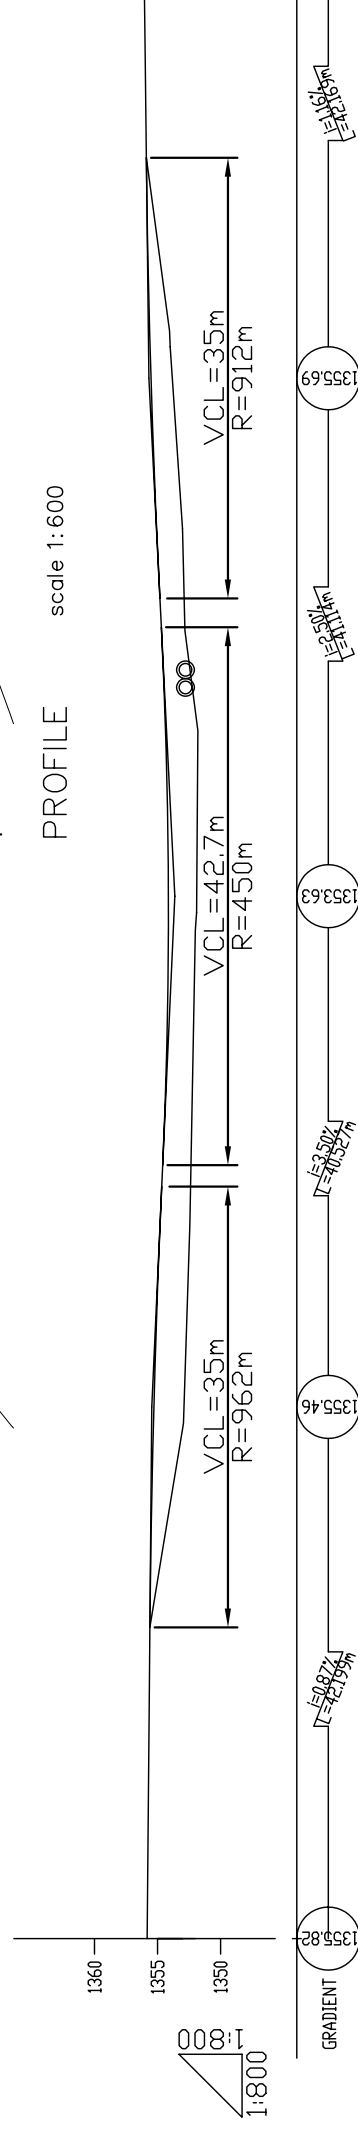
Construction Plan of Khujirt Bridge(2)
